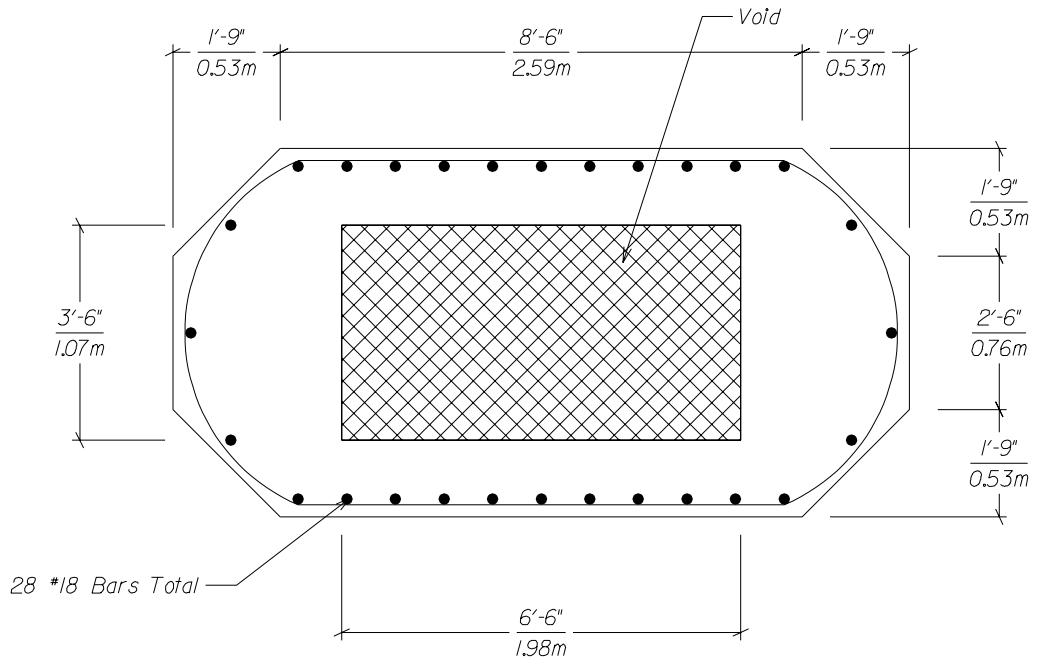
Column Cross Sections for Piers 2 to 5 and 10
